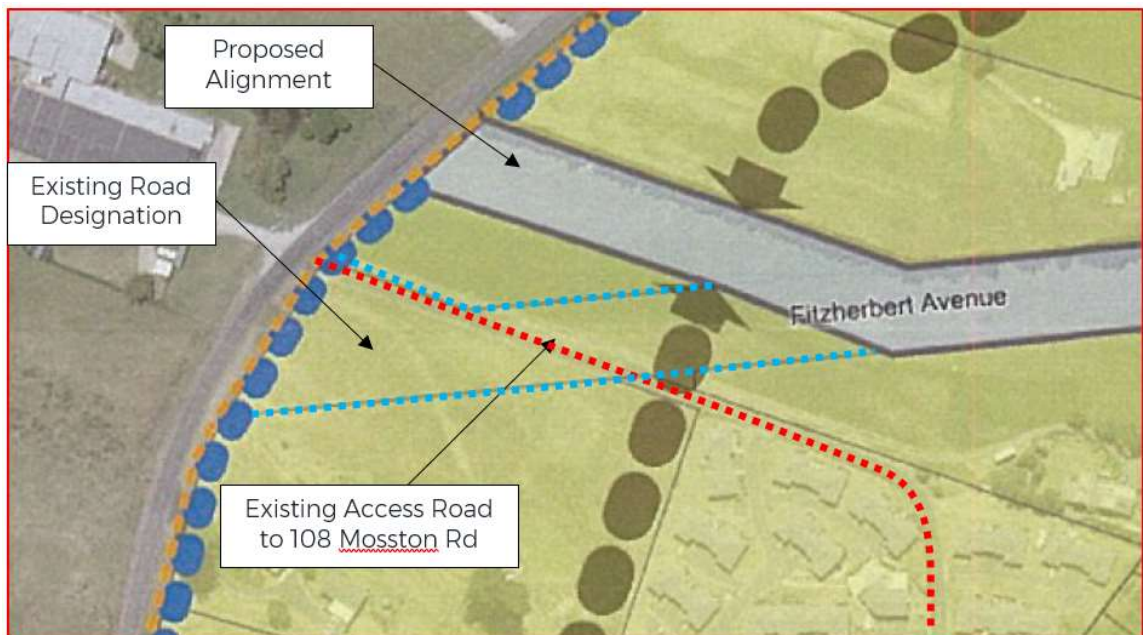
Existing Fitzherbert Avenue Extension Road Designation and Proposed Alignment
